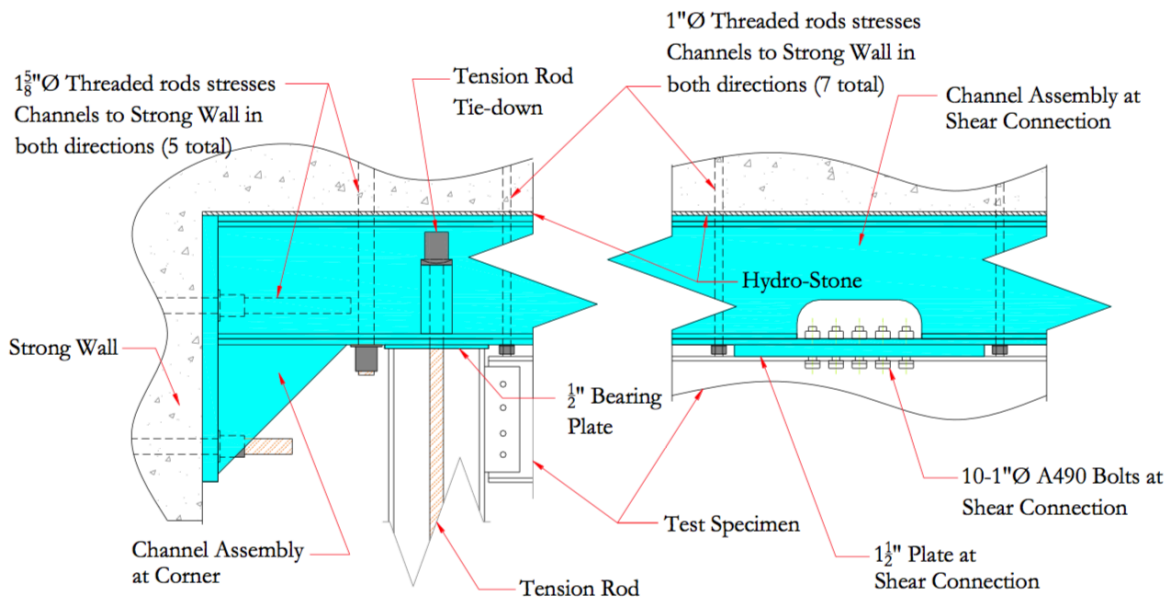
Plan View of Channel Assembly and South Base Connection [Powell, 2010]
